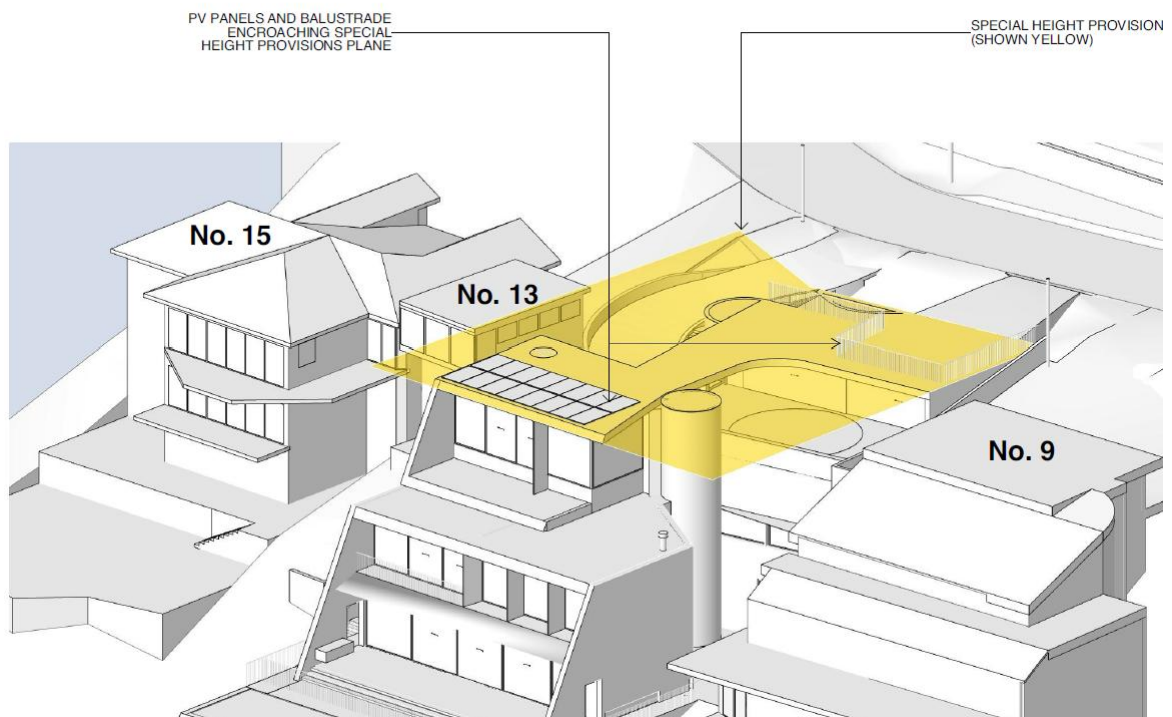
the special height provision exception relates to the steel balustrade, western driveway upstand, solar panels, landscape elements upon the roof
